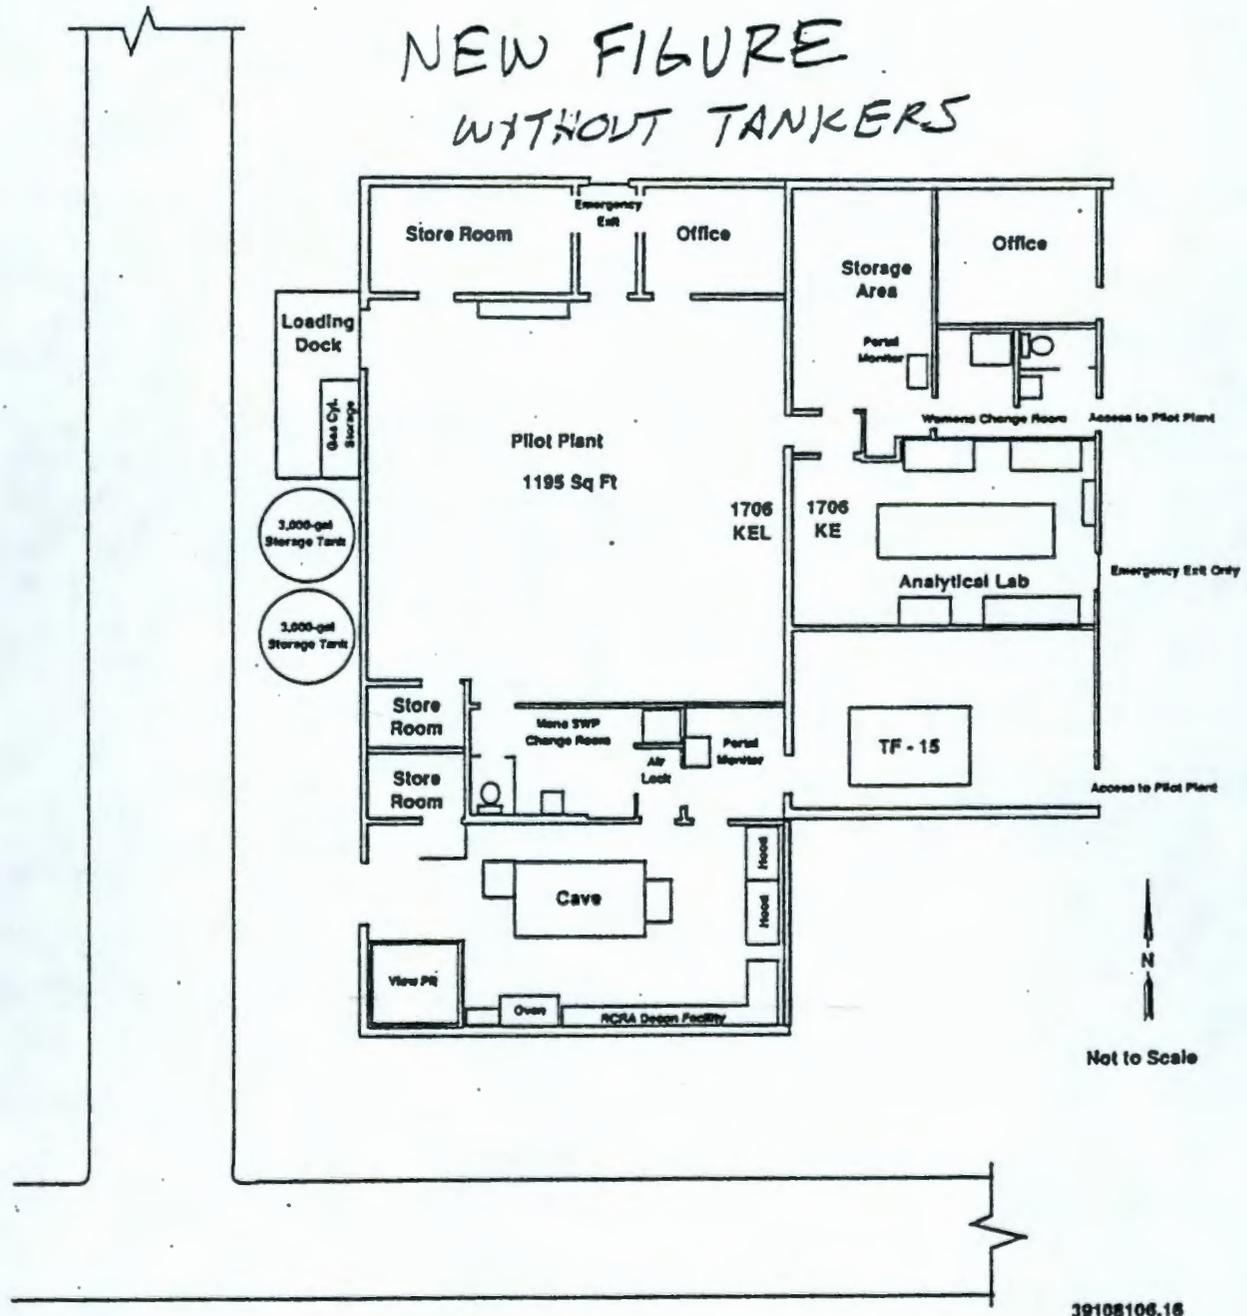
Waste Water Pilot Plant Floor Plan.
